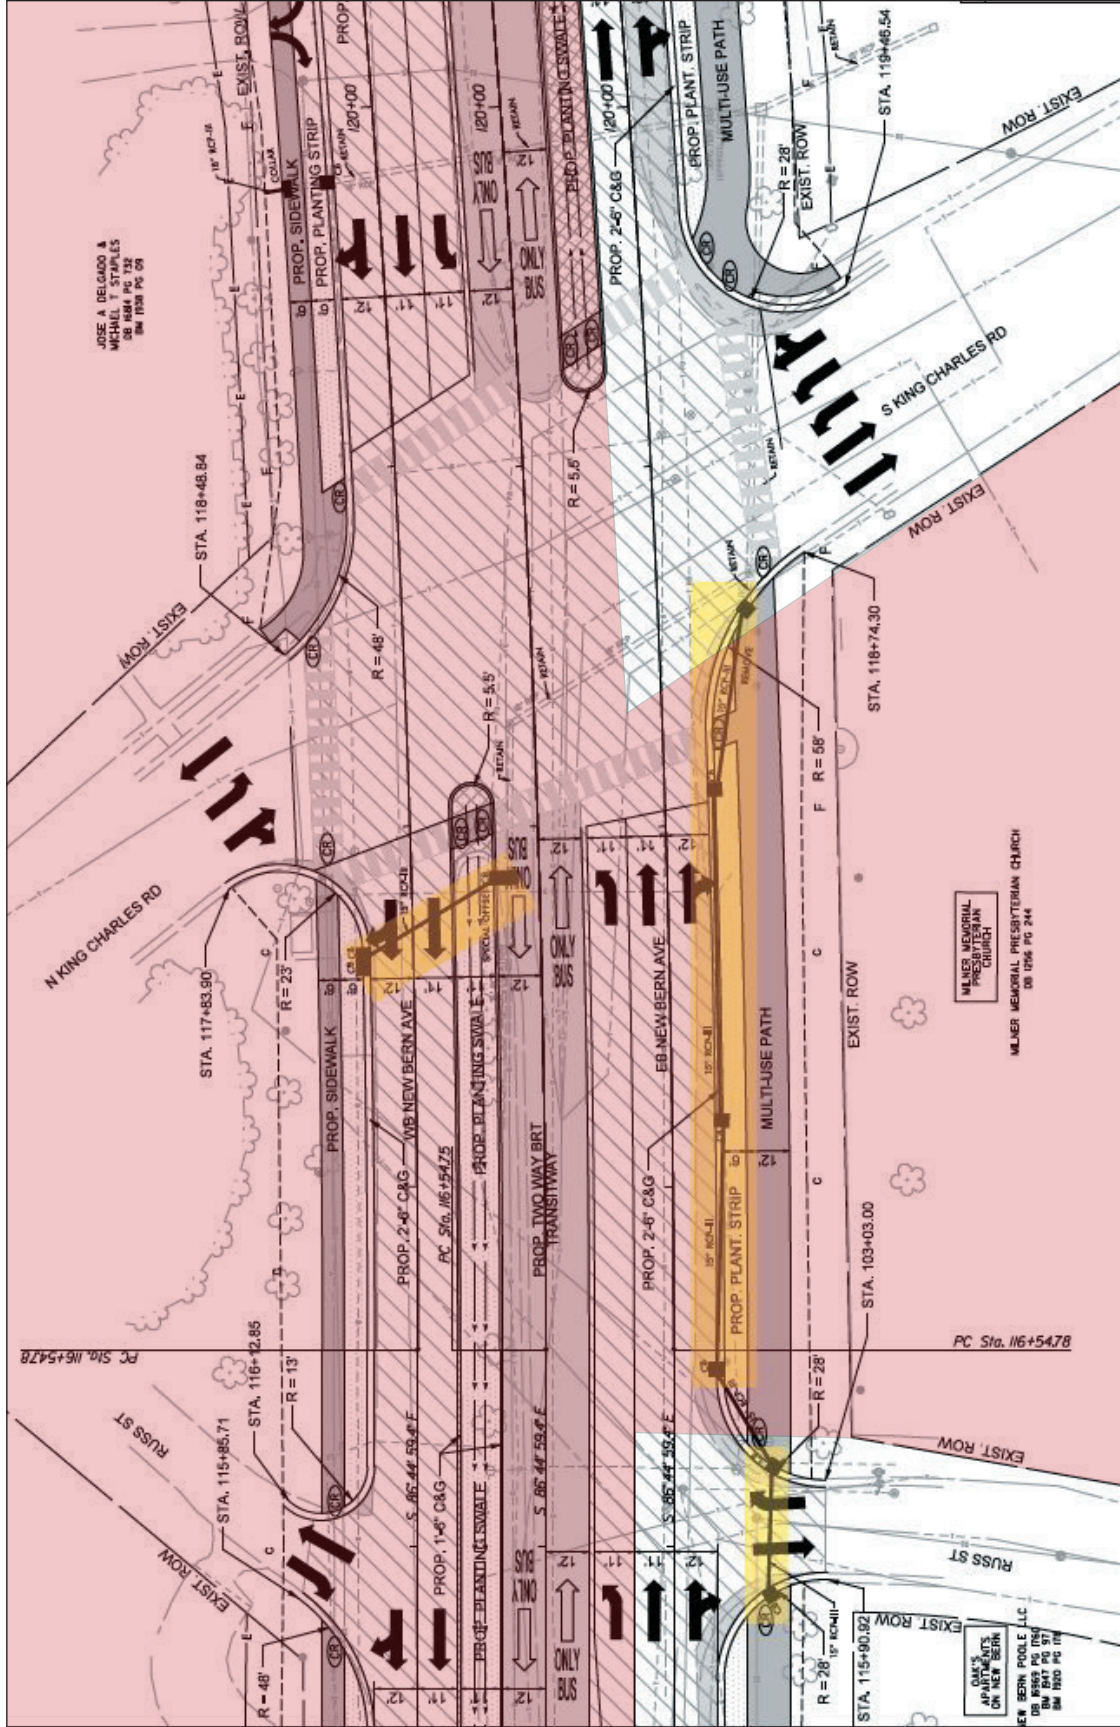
New Bern Avenue Improvements and Longview Gardens Historic District (red), Wake BRT New Bern Corridor Preliminary Plans, Sheet R-NBN-026, 2020
